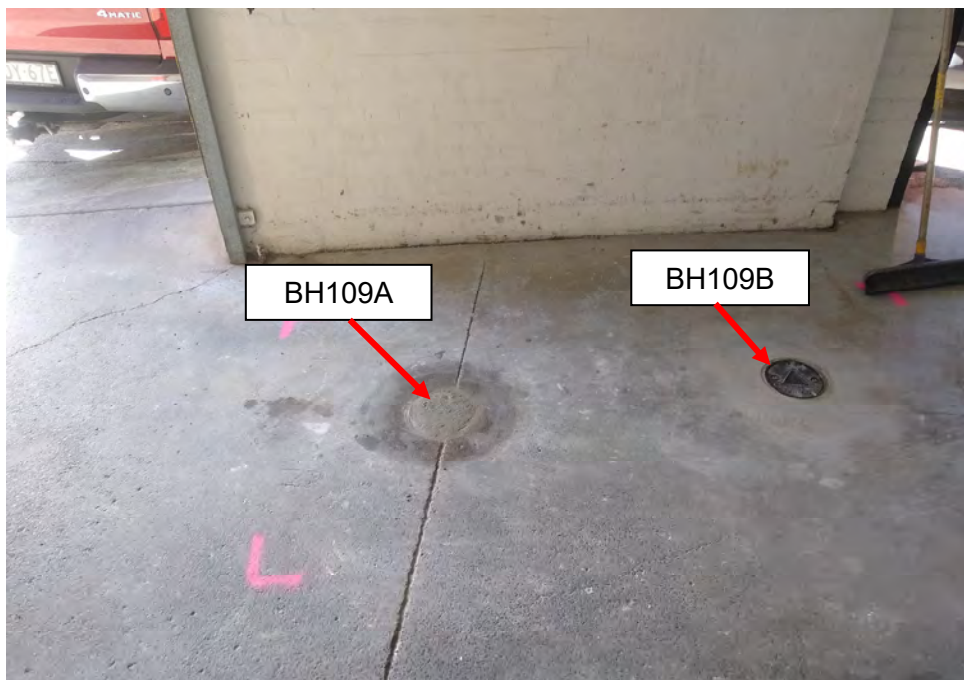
View north-east at the loading dock entry from Ambulance Avenue, at Lower Ground Floor level. The locations of boreholes BH109A and BH109B (with installed standpipe) are indicated as shown.
